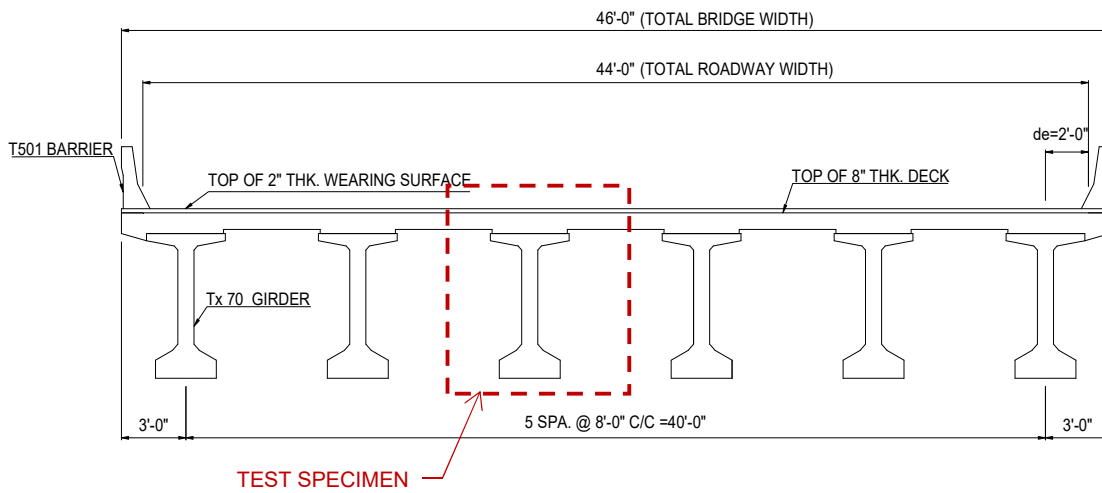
Cross-section of the Prototype Bridge Showing the Test Specimen.
